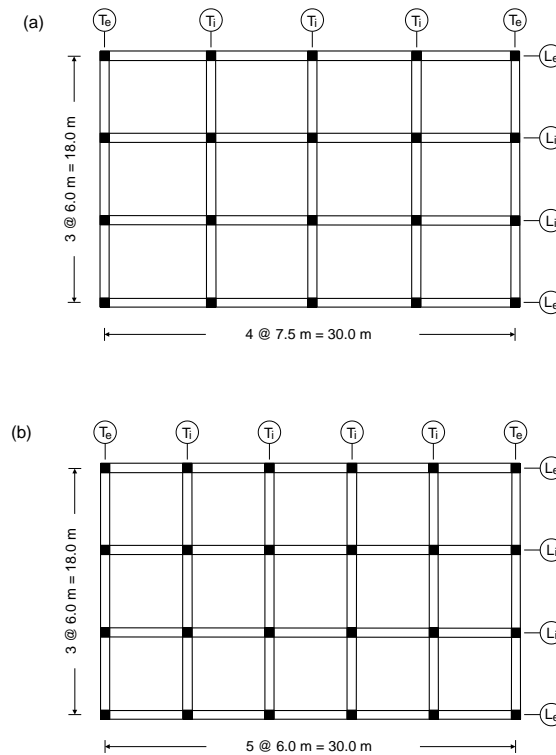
Floor plans of the buildings: (a) buildings in Ottawa, (b) buildings in Vancouver.
